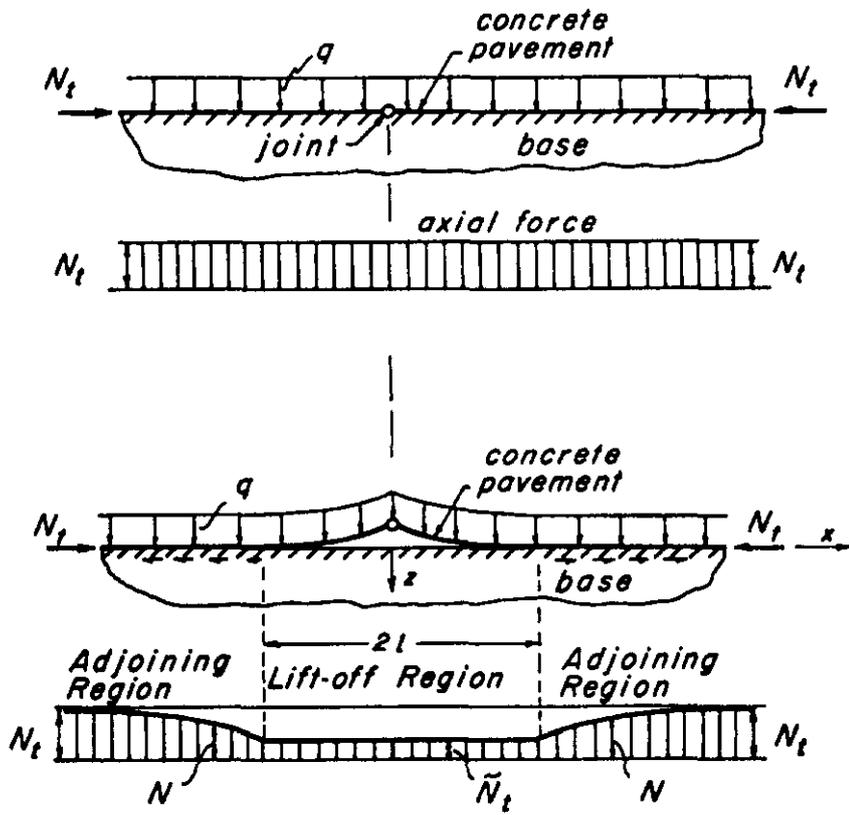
Axial forces in a concrete pavement after a blow-up [18]
